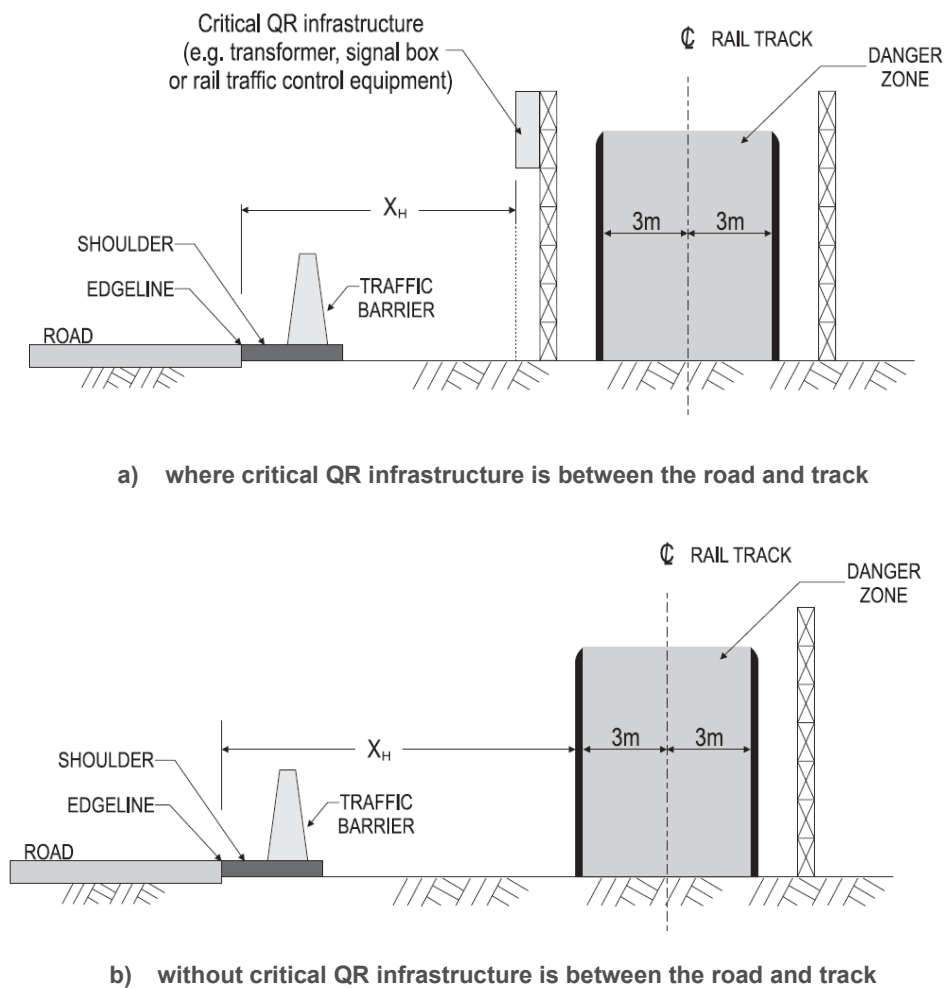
Examples of Horizontal offset (X_H) measurement and traffic barrier placement
